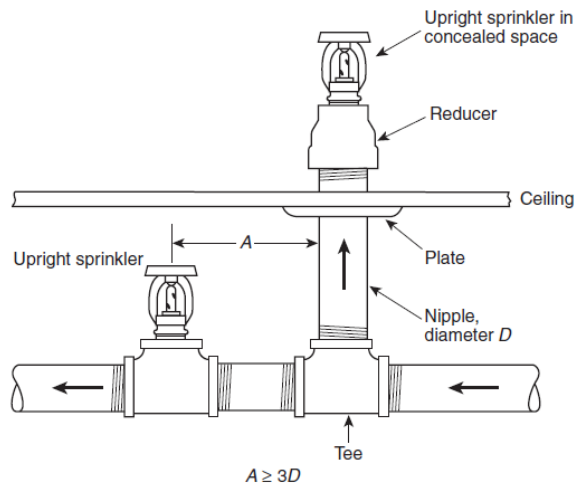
(b) Sprinkler on Riser Nipple from Branch Line in Lower Fire Area.
